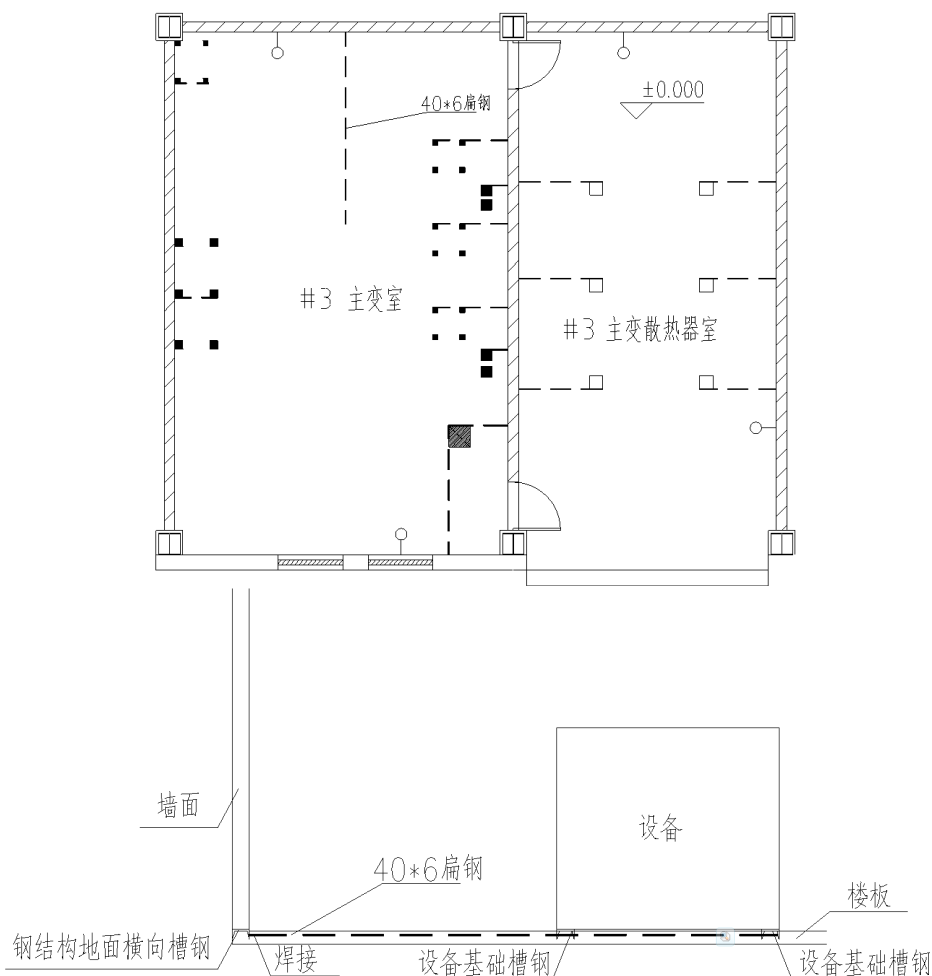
The ground connection of electrical equipments in steel structure fabricated substation
